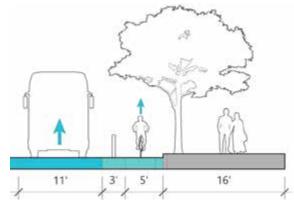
Bus on an Typical Arterial Street with On-Street Parking and a One-Way, Sidewalk-Level Class IV Bikeway.
